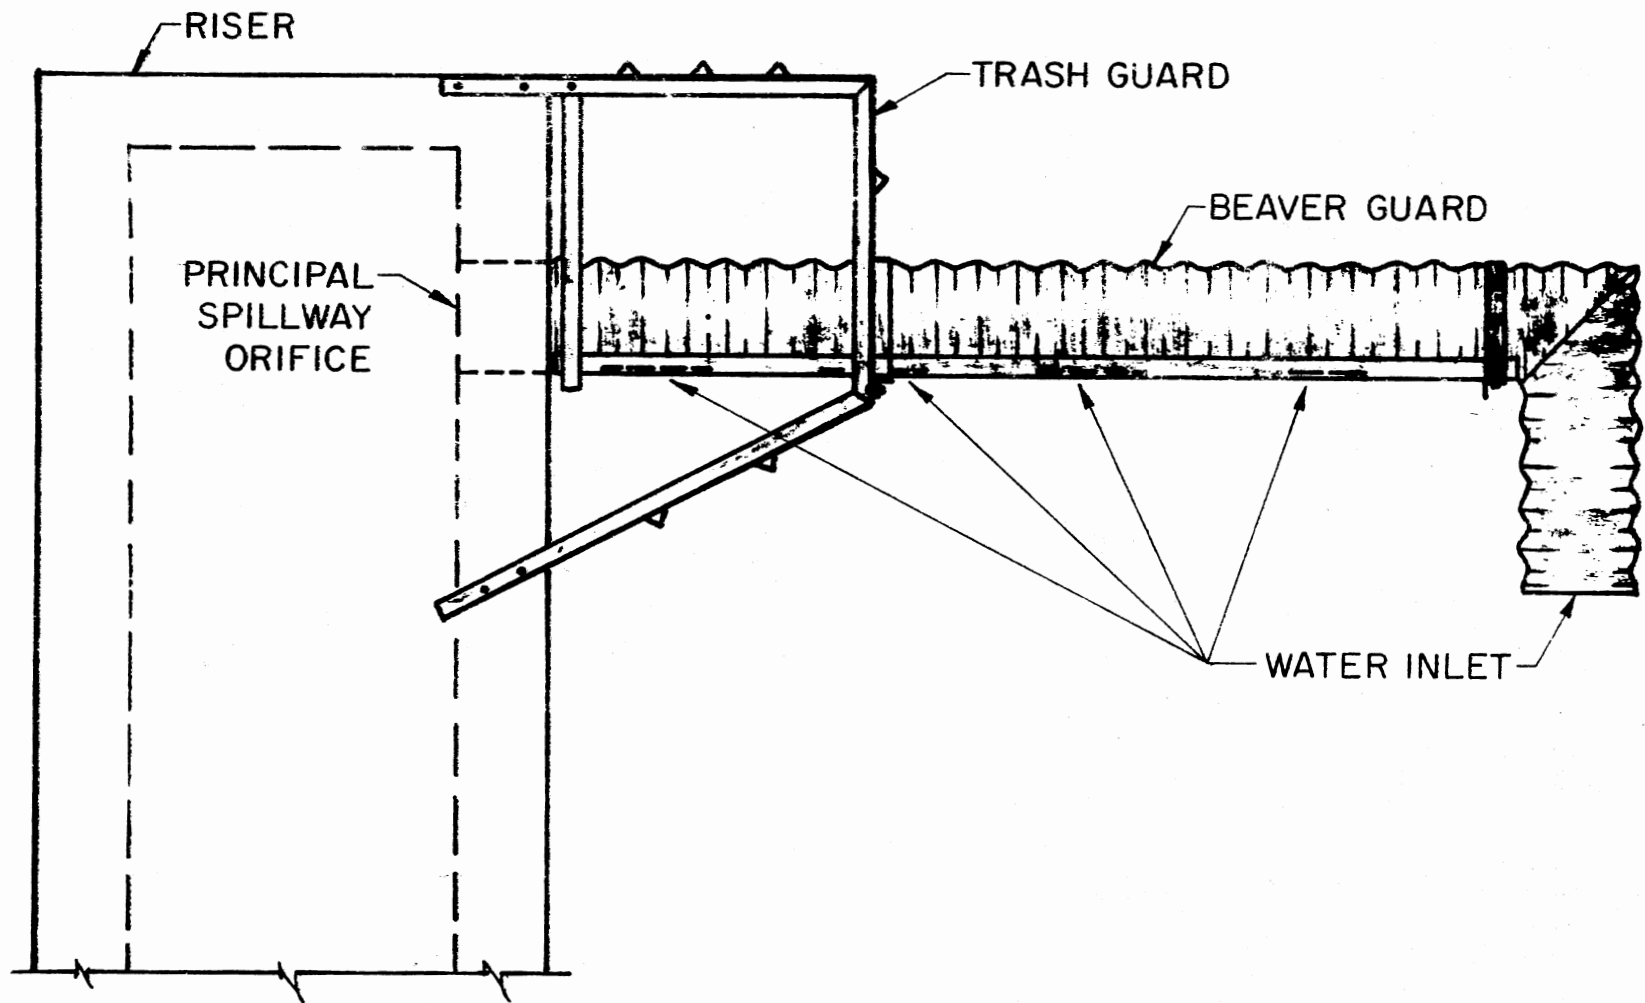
Beaver guard type 7 has not been plugged, although it was installed on a riser which had been plugged by beaver just prior to installation of guard
